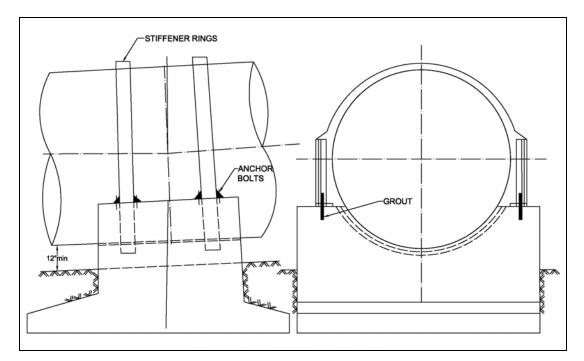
Typical Concrete Anchor (Source: USBR-Engineering Monograph 3- Welded Steel Penstocks)
